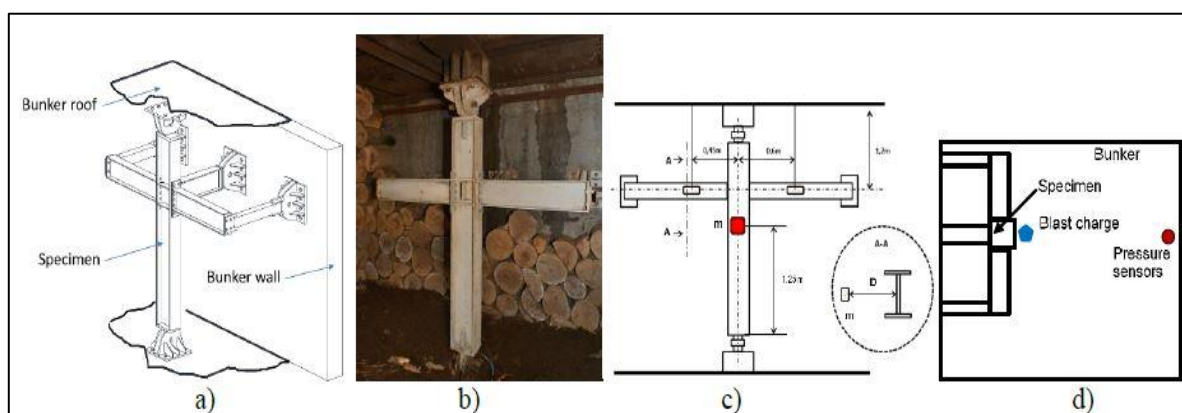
Test specimens inside the bunker: a) view of the specimen; b) photo inside the bunker; c) front view with the position of blast charges; d) plan view with specimen and pressure sensors inside the bunker.
